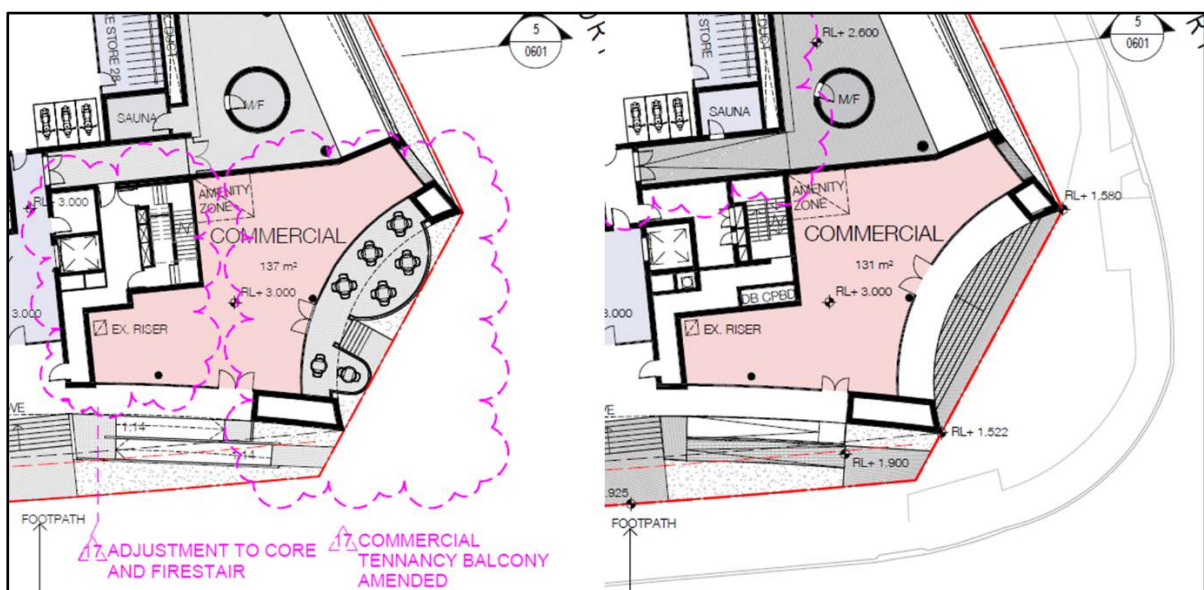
| Approved (right) and proposed (left) ground floor commercial tenancy layout (Source: SSD 8019 Approved Plans and SSD 8019 MOD 1 Plans)
